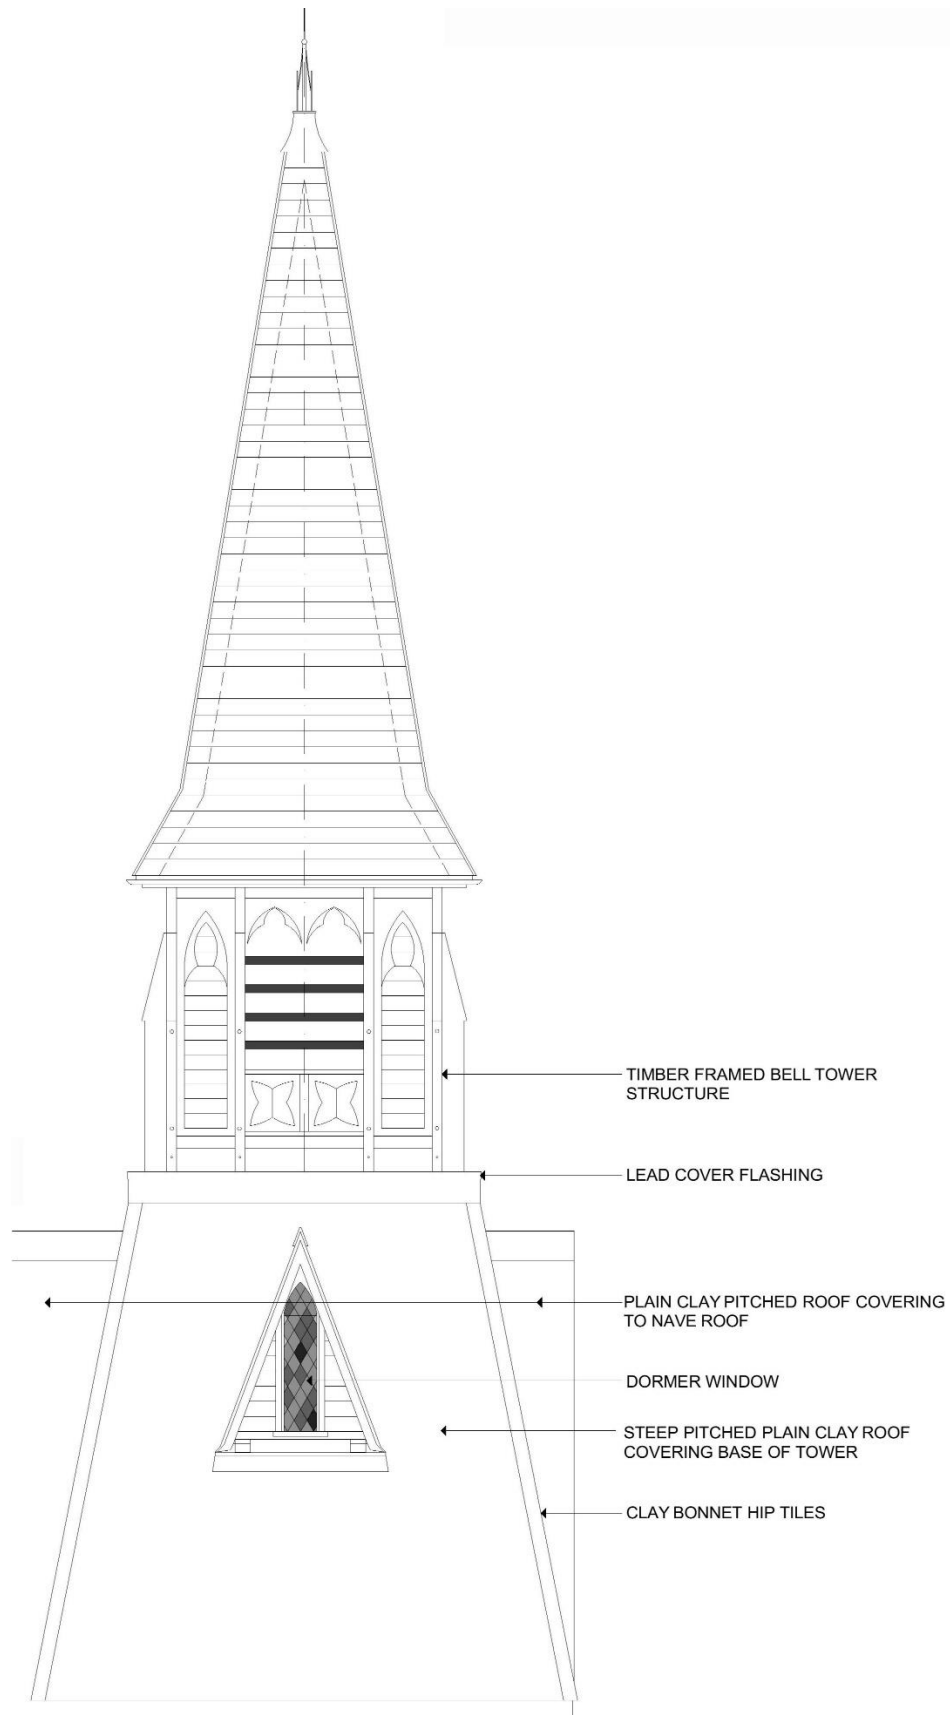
Extract from application drawing showing the existing Bell Tower (NTS).
